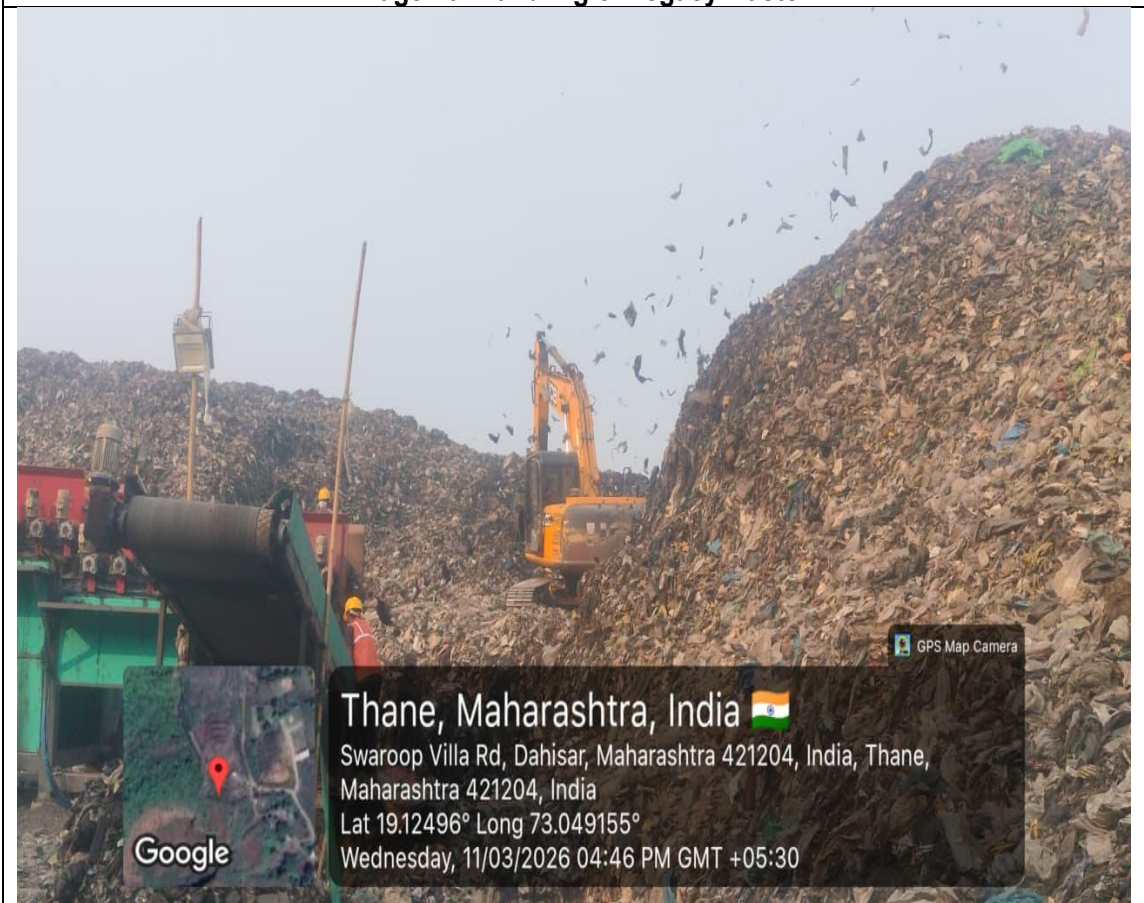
Whiling Handling of Legacy waste, waste from heaps suspended in air.
